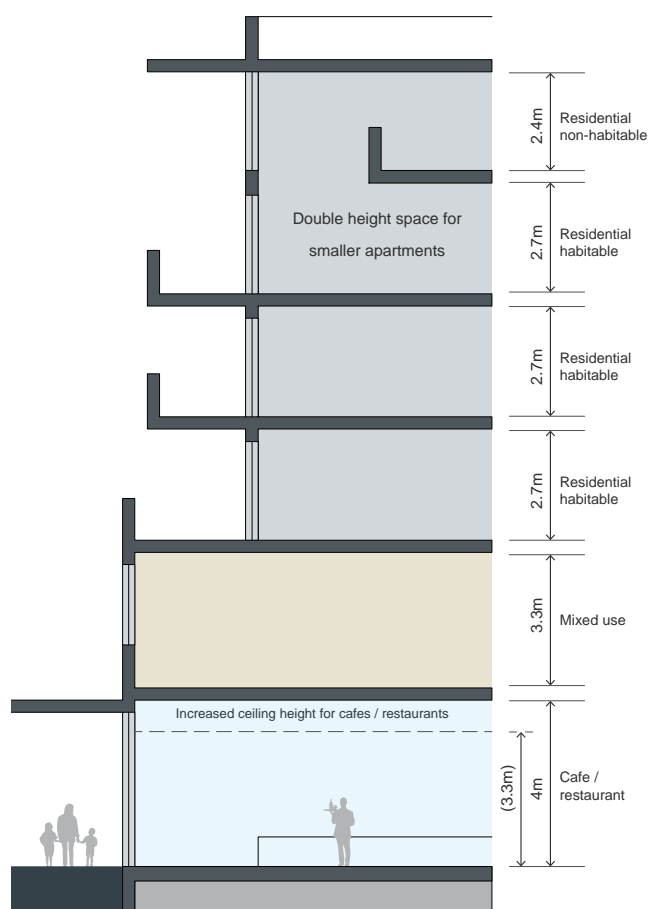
C.1 Greater than minimum ceiling heights for retail and commercial floors of mixed use developments are encouraged to promote flexibility of use. Cafe and restaurant uses need greater minimum ceiling heights of 4m to allow for additional servicing needs
